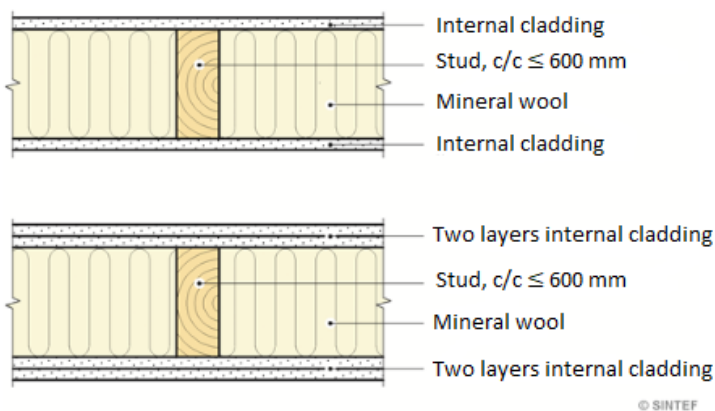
Principal design of internal wall with single-stud timber studwork and one or two board layers on each side of the wall
